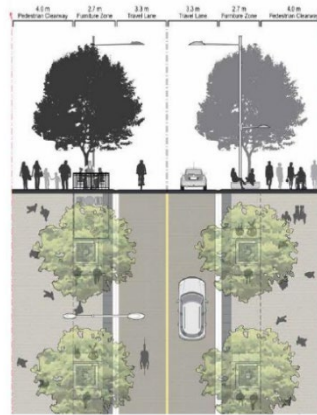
Typical Cross Section from Gerrard Street to Queen Street
